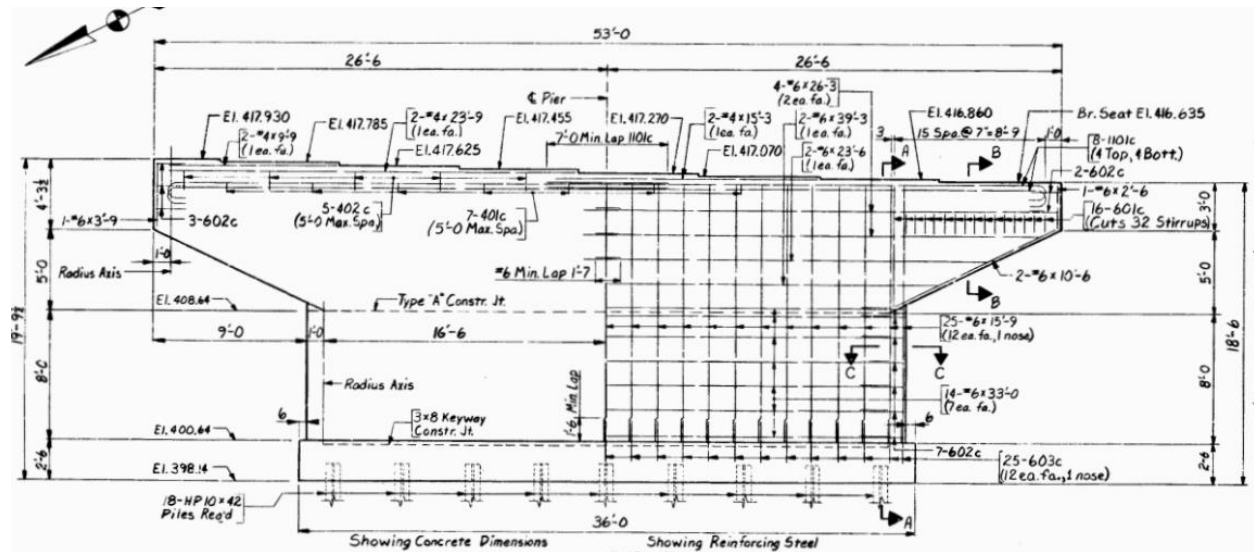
Transverse Elevation of Interior Pier (NBI 22190) (1981)
